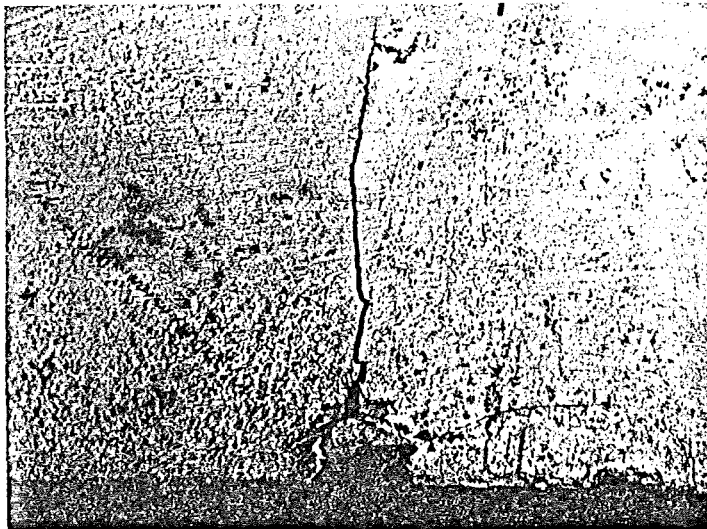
Fracture at the point of impact on the first interior beam. Crack is shown running through the flange and part way up the web.
